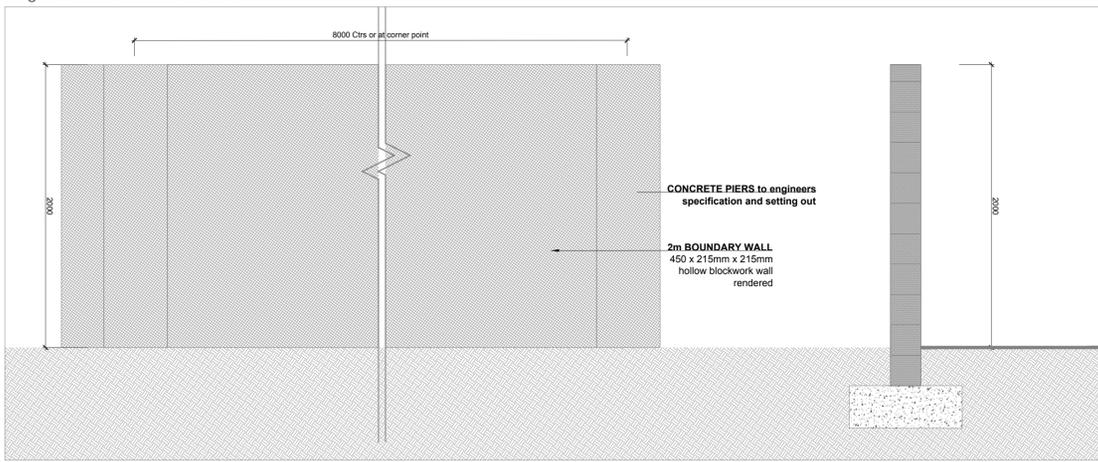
B - BOUNDARY TYPE 1 - ELEVATION ENTRANCE PILLAR
